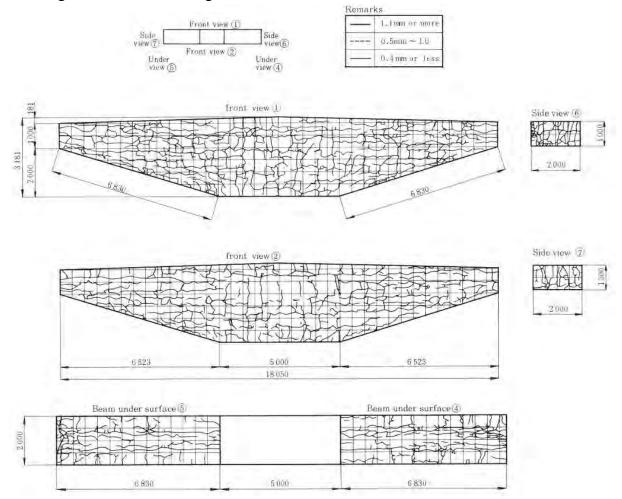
Crack on the concrete pier beam
